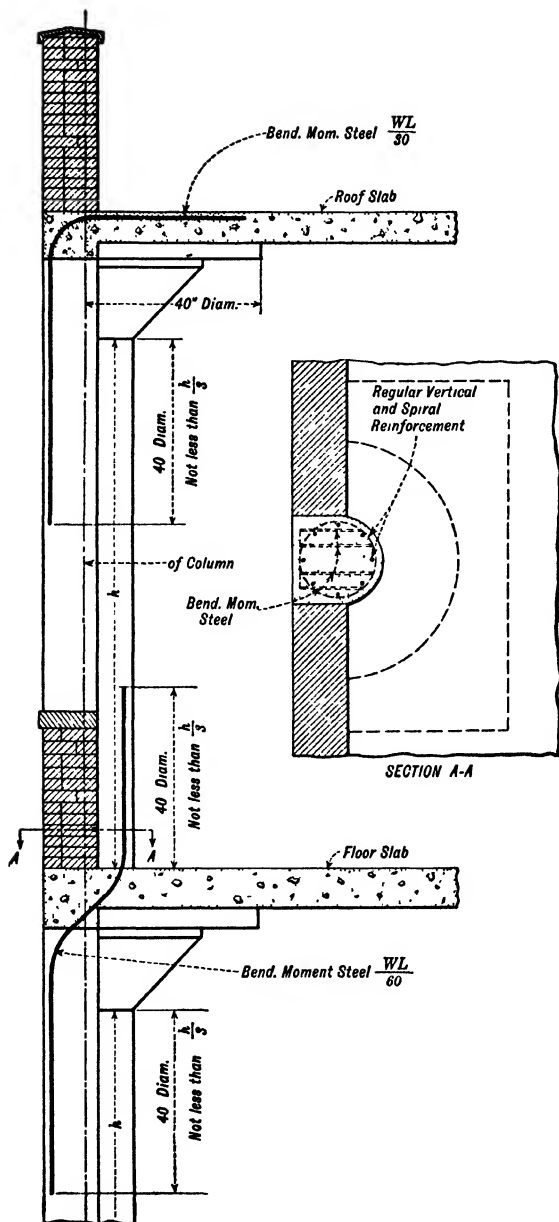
Wall Column Reinforcement, Chicago Ruling. (See p. 317.)
